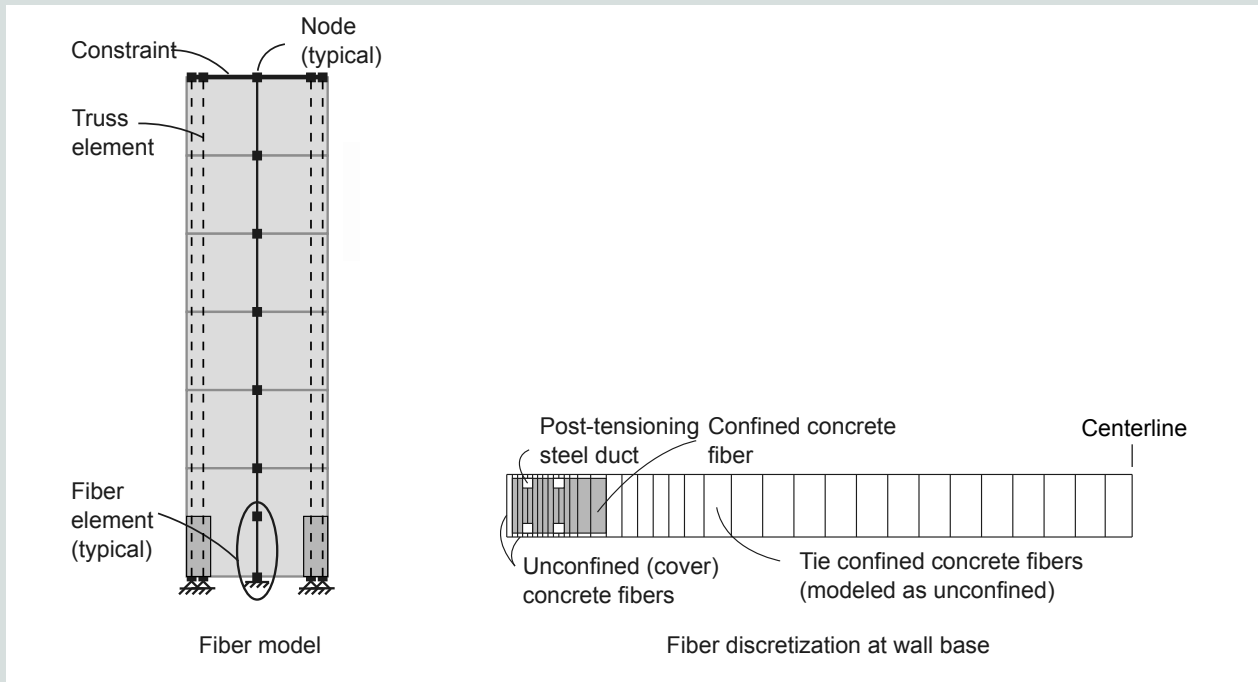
Fiber model of an unbonded post-tensioned precast concrete wall.
